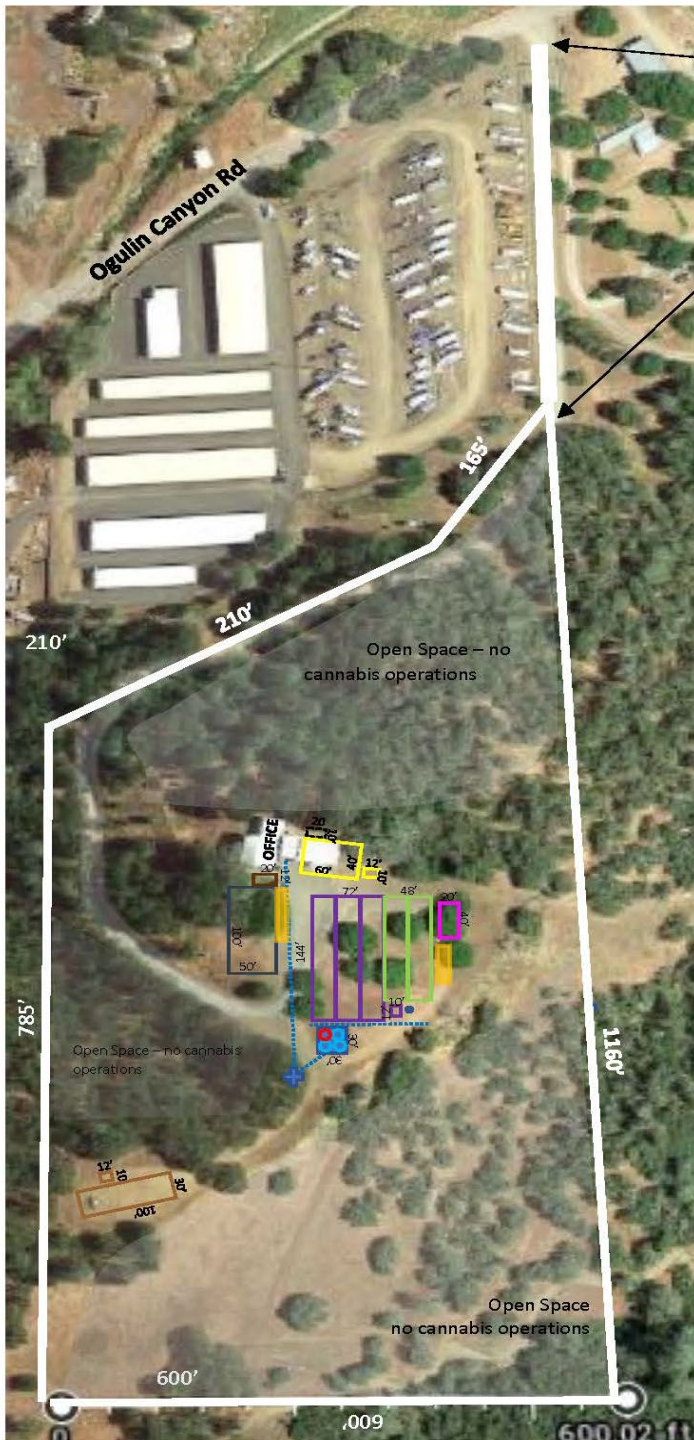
Site Plan Diagram Full Detail with Delivery Only Retail
